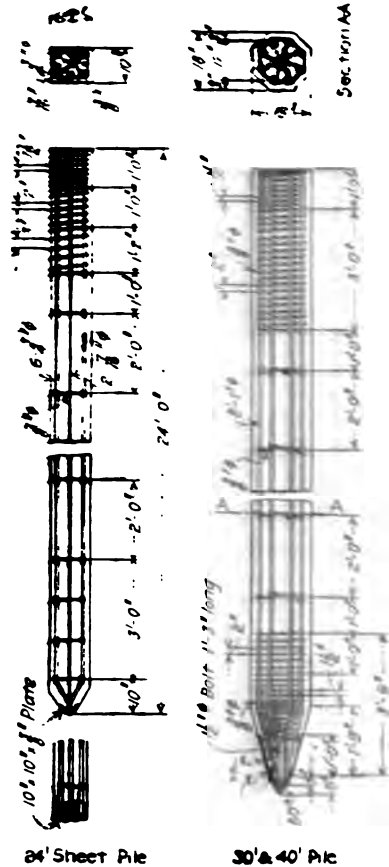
Details of piles used in ore dock construction at Cleveland.
